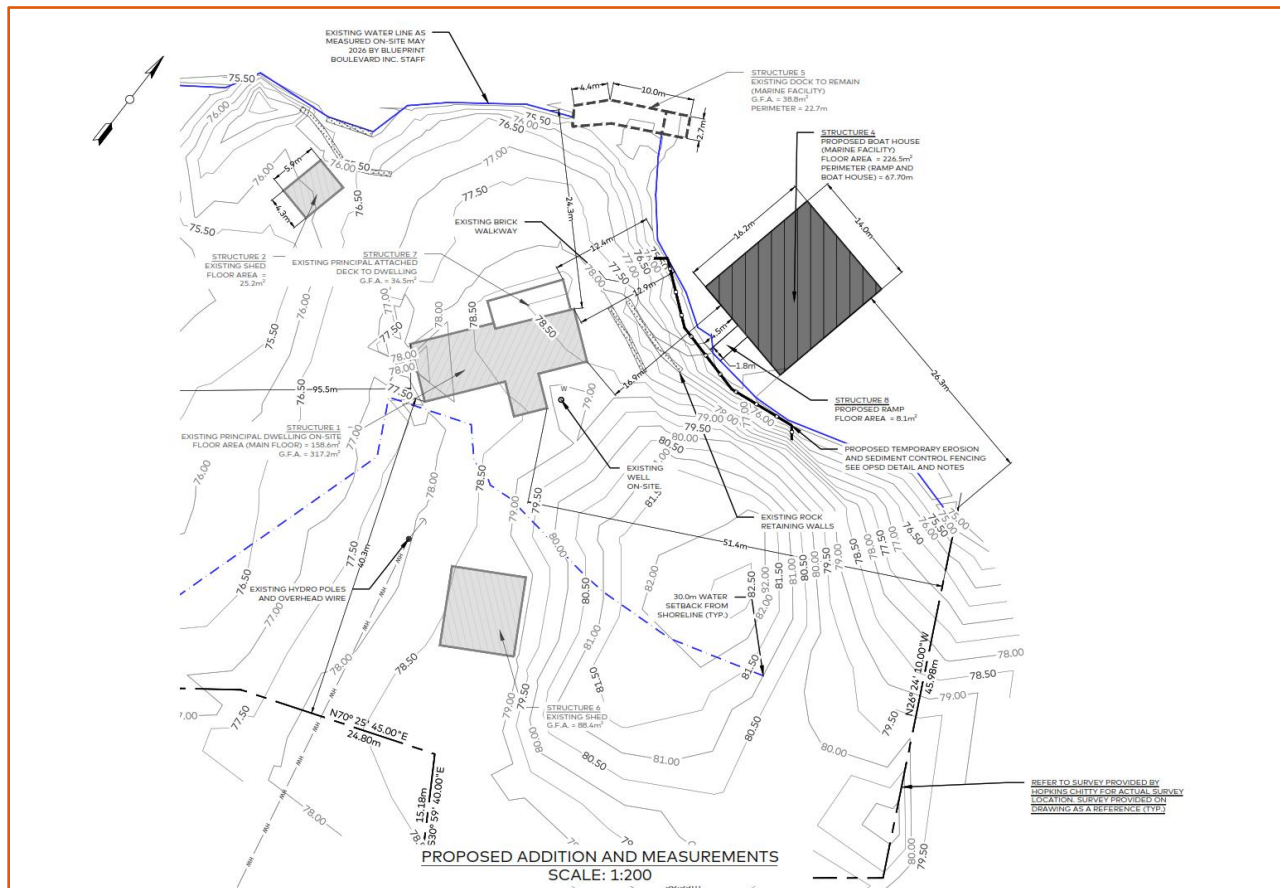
Site Plan for the Property showing the existing family house (Structure 7), existing dock (Structure 5) and the proposed boat house (Structure 4) at the same location as the existing boathouse. All other existing structures and improvements on the property are proposed to remain. Site Plan prepared by Blueprint Boulevard Inc.
